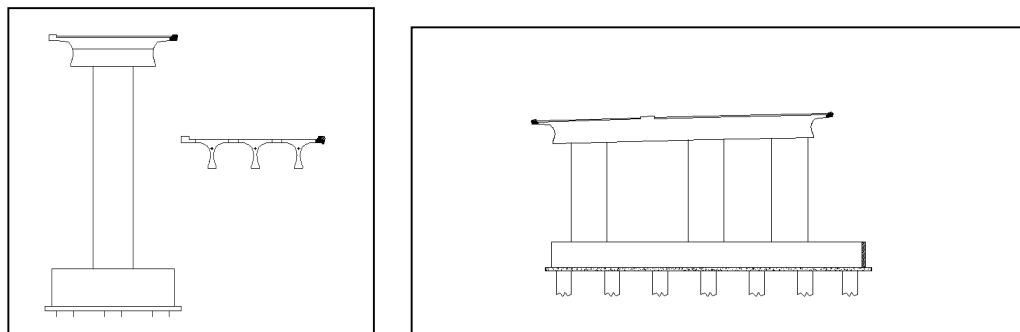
Schematic view of single and multipier bent (Asse dei Servizi)
